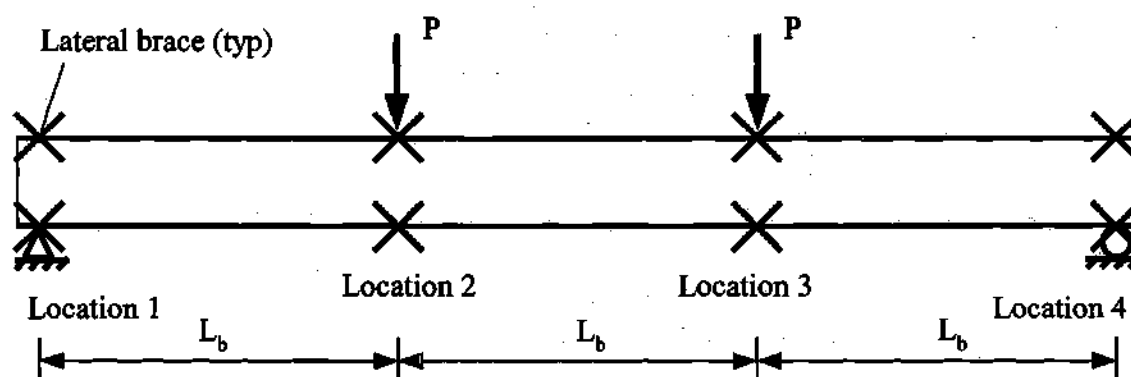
Configuration of laterally unsupported straight girders.
